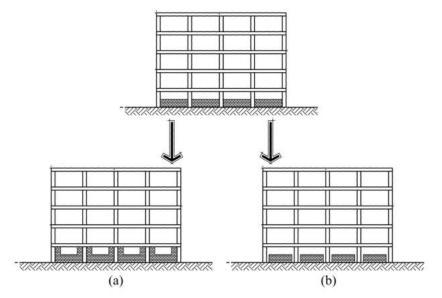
Effective measures to prevent stiff storey: (a) Changing the size of openings, (b) separating walls from columns
